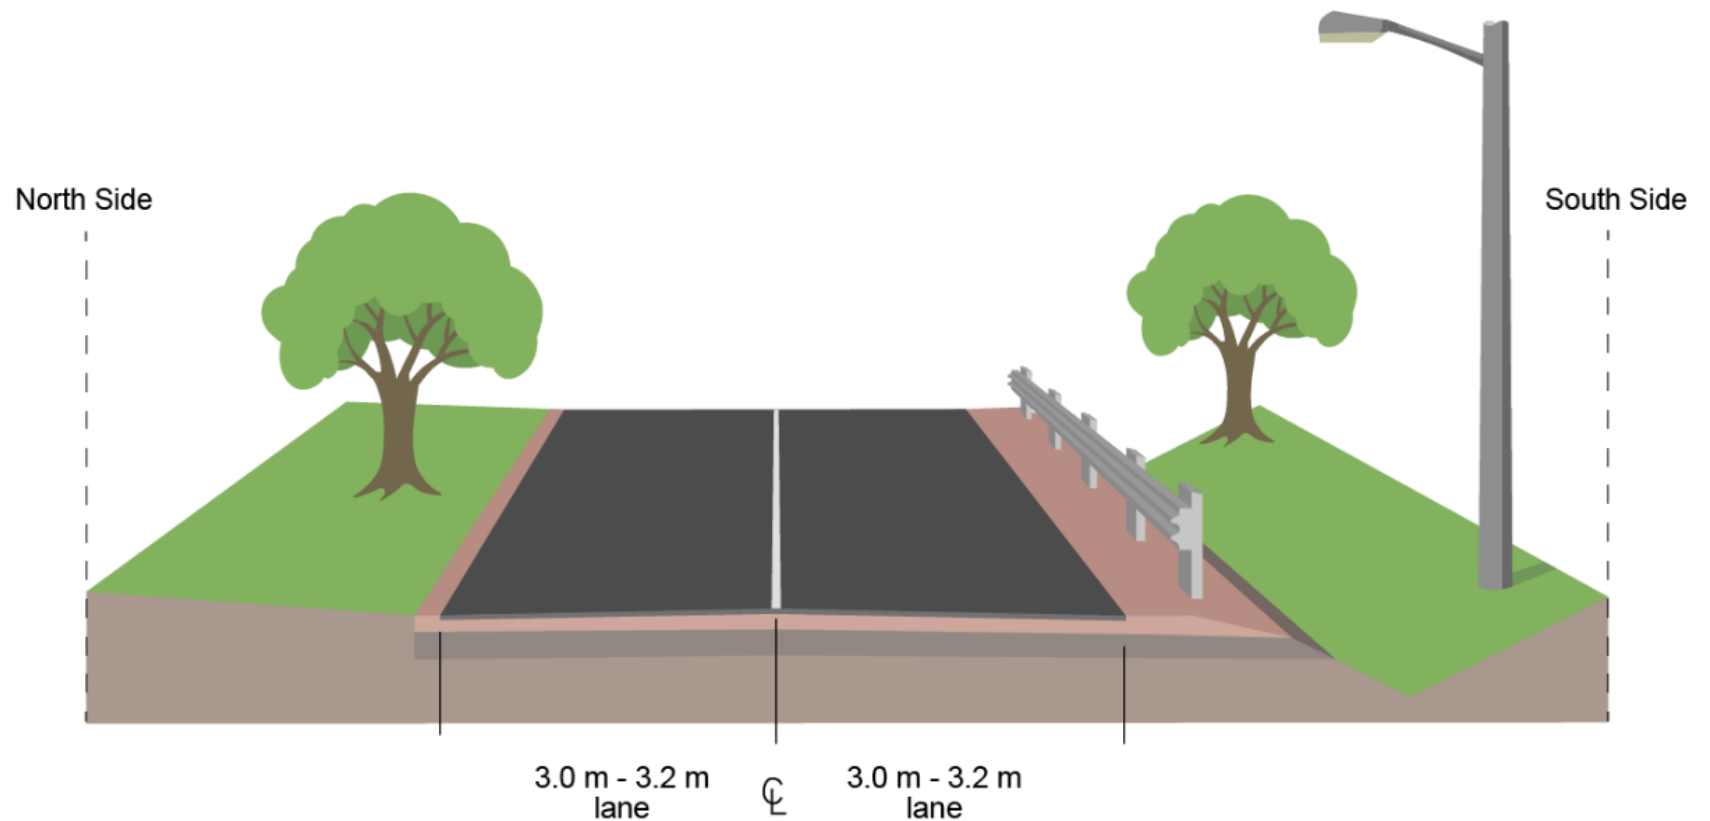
Recommended Cross-Section (Tangent Section, 4.0m wide lanes at curves)
